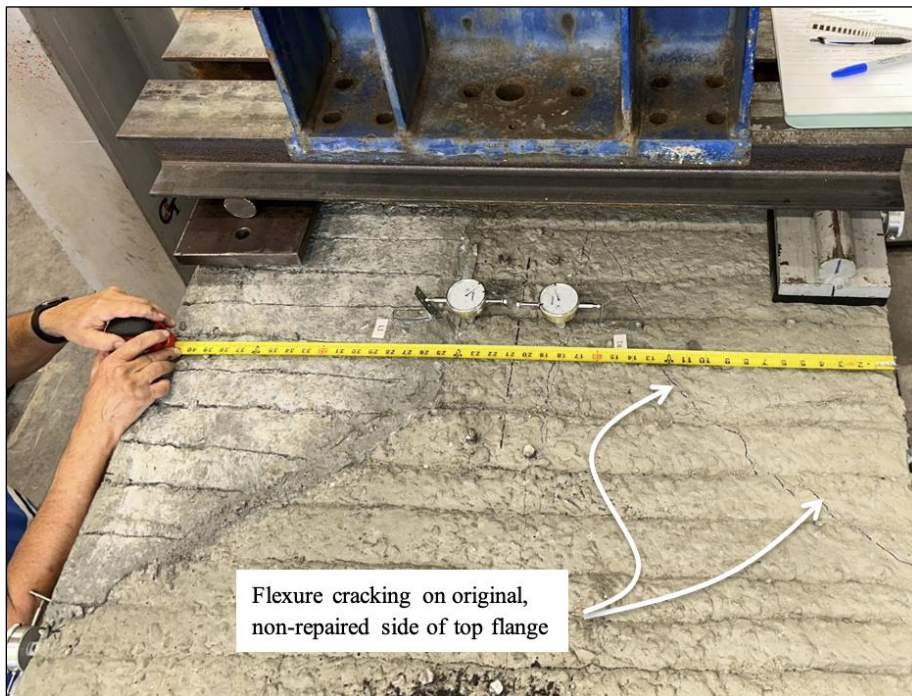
Photo. Test 1.2.F (repair 1.2LTF) top flange flexural cracks on original, nonrepaired flange at 30 kip (from above).
